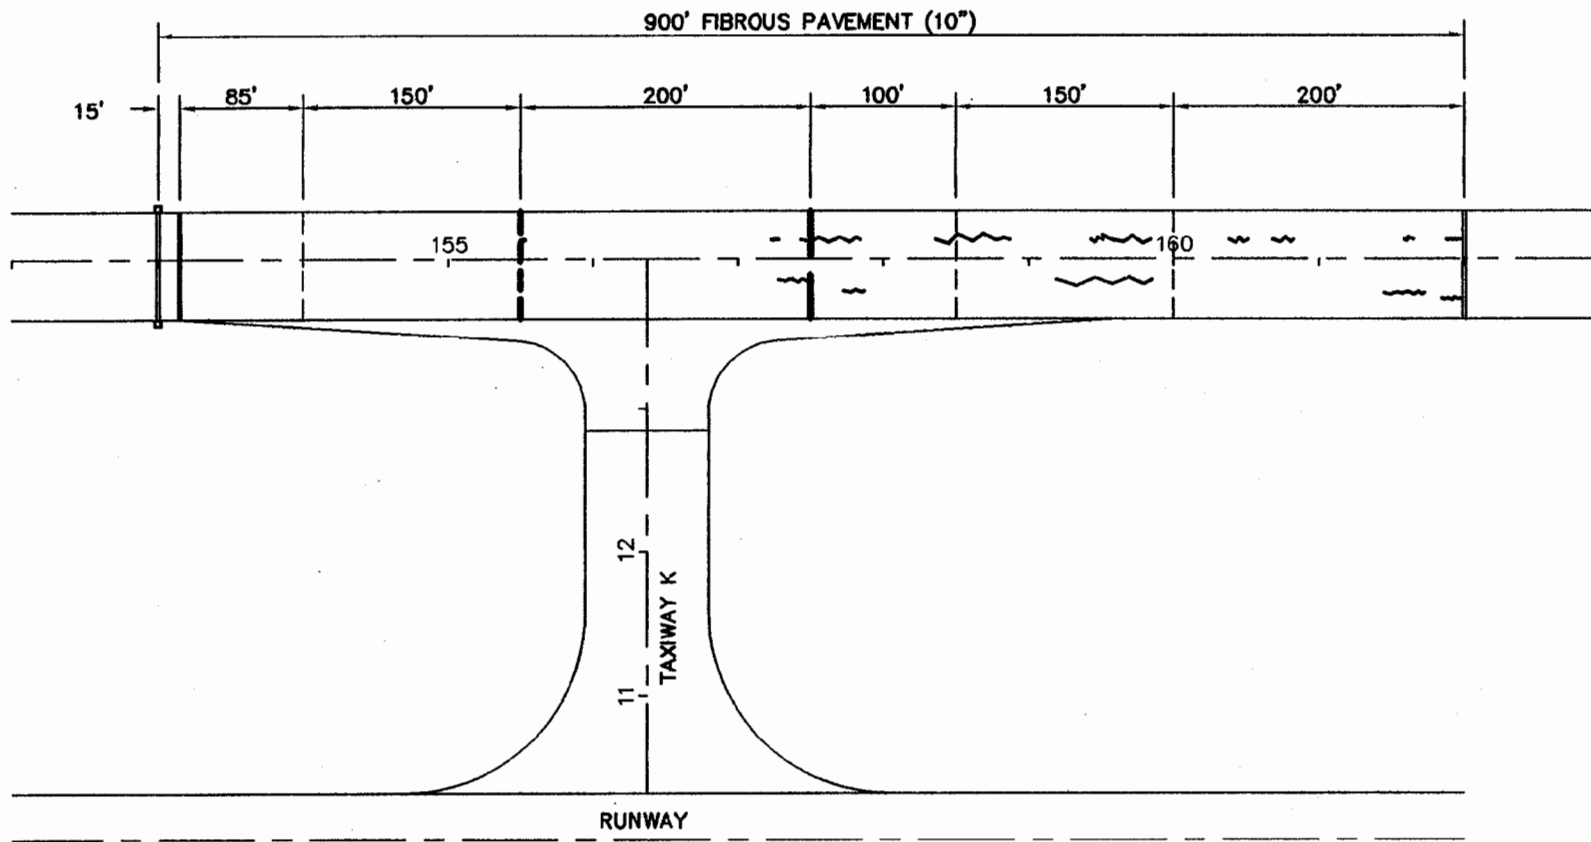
MAJOR LONGITUDINAL CRACKS IN FIBROUS PCC PAVEMENT, SUMMER 1998
